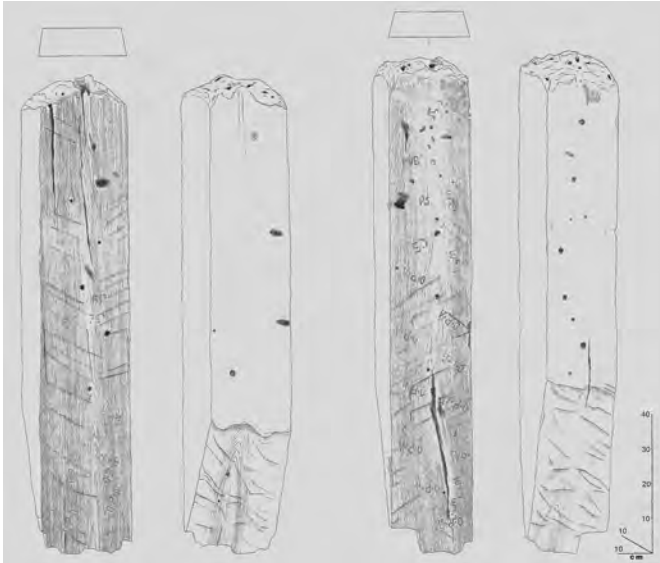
Inner harbour concrete pier at Anzio, details of lower portion of two vertical timber planks from the shuttering (Felici 2002: fig. 14; used with permission).
